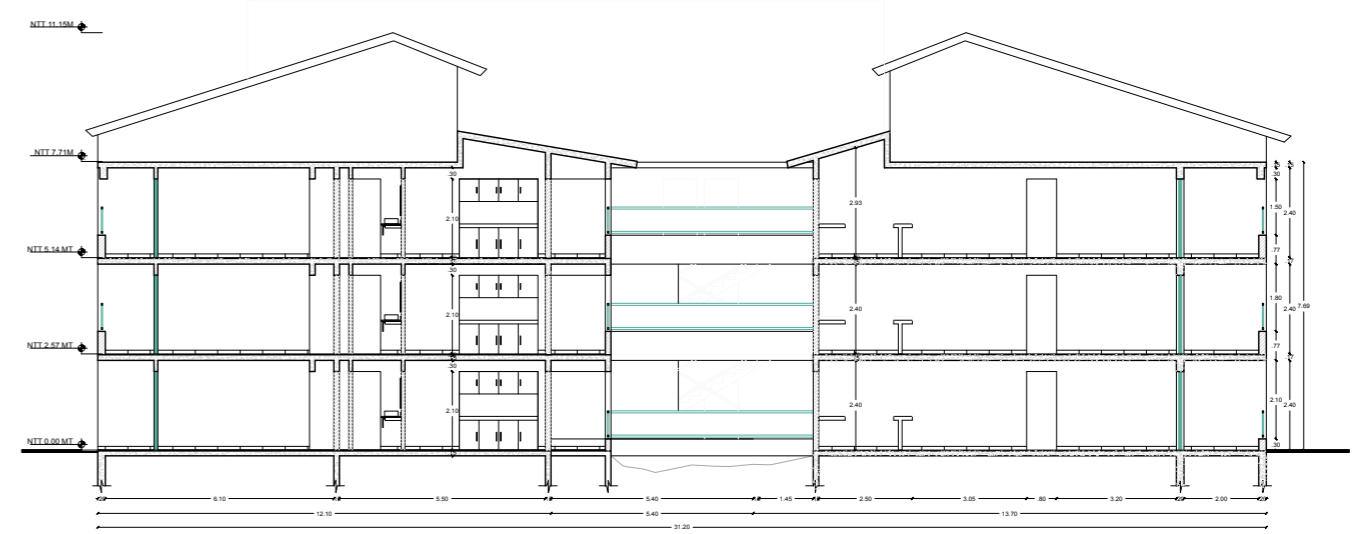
Section Plan A-A of Guest Block 16. Source: Emotions by Hodelpa (2021)
